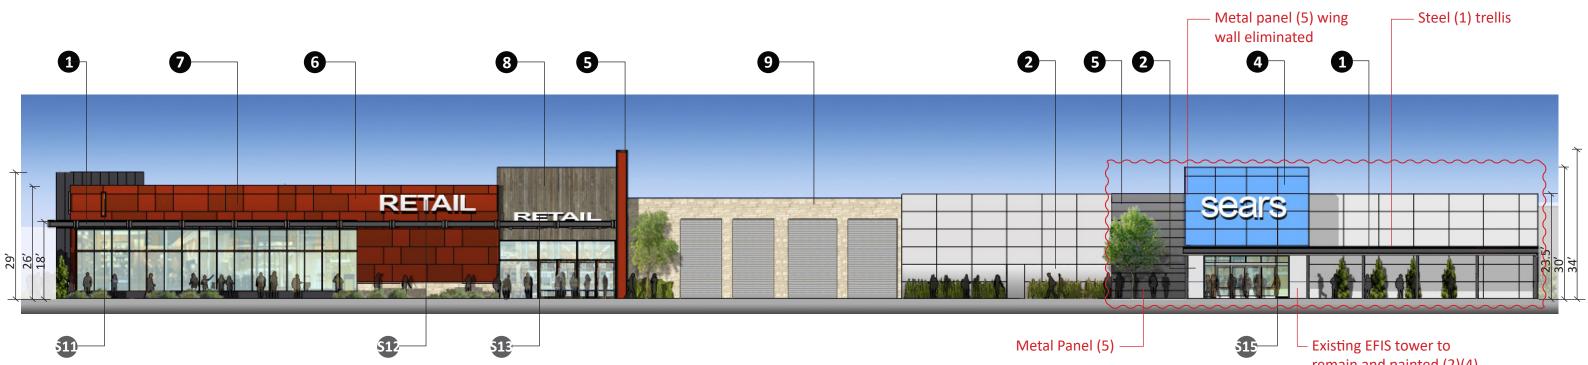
REVISED ELEVATIONS April 16, 2018
